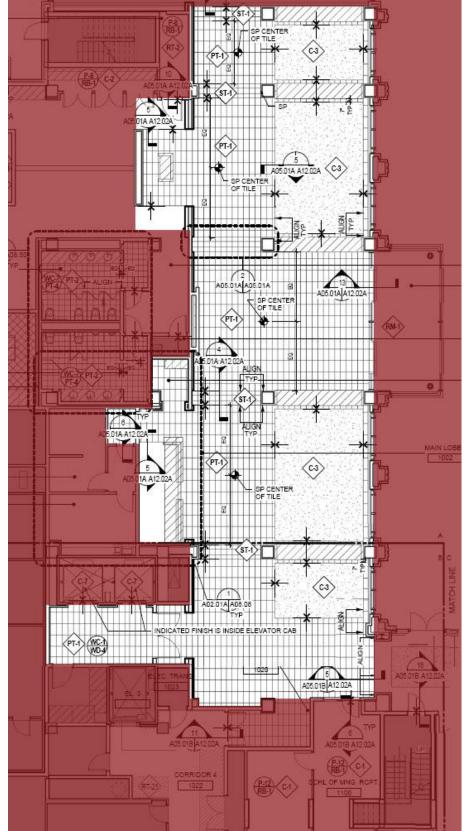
Floor Finish Plan (mainly carpet and tile) | NTS
